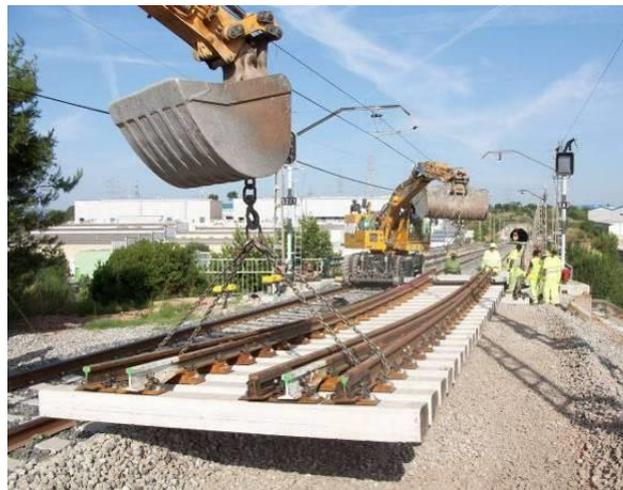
Installation of new switches in segments by rail-road excavators (source: COMSA).
